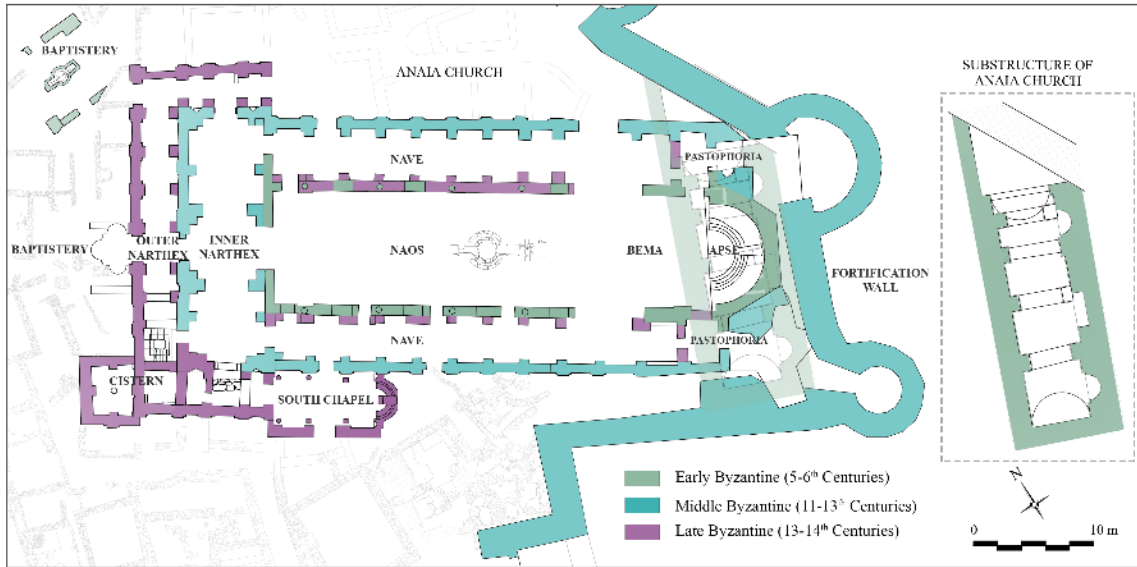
Plan showing the spaces and construction periods of Anaia Church (Revised from the drawing by Mehmet Buğra Kanmaz and Umut Kardaşlar, Source: Kadikalesi excavation archive, 2020)
